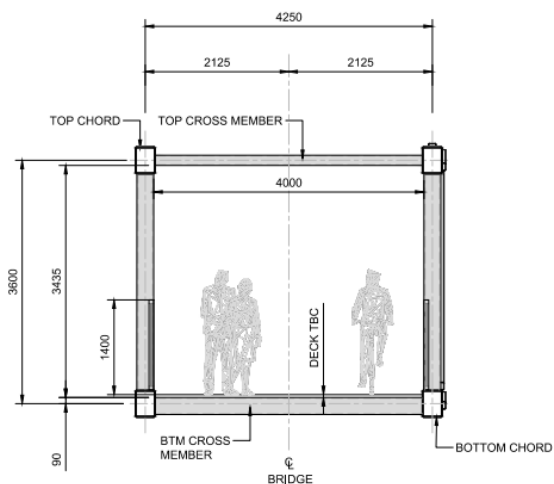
Case Study – Cross-Section of Warren Truss Structure¹⁴
